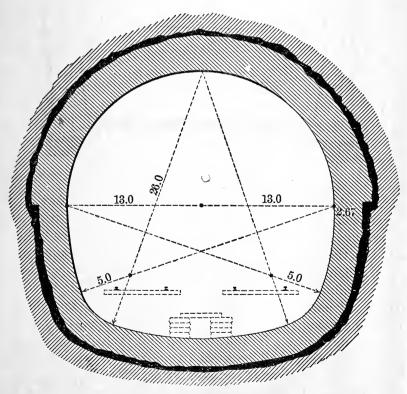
HOOSAC TUNNEL. SECTION THROUGH SOFT GROUND.
